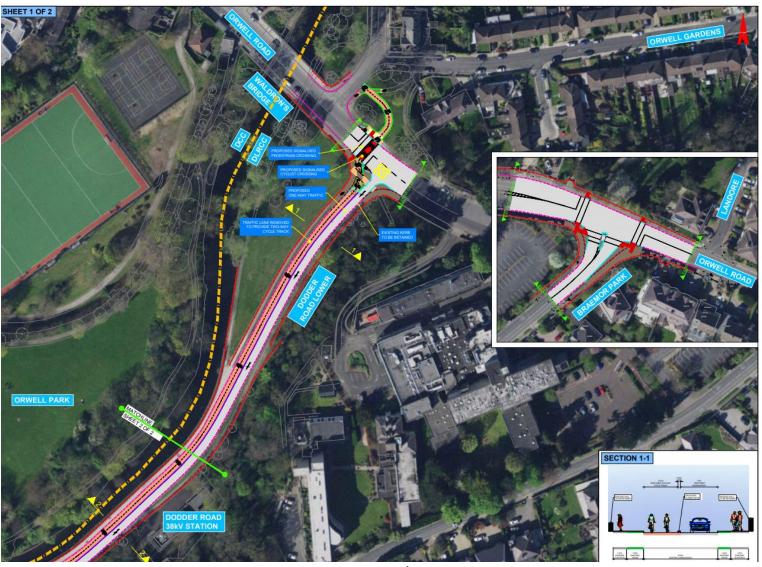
Orwell Rd to Dodder Rd Lwr Rapid Deployment Scheme 1/2 Source: Cycling Design Office. A full scaled version of the drawing is available separately.
